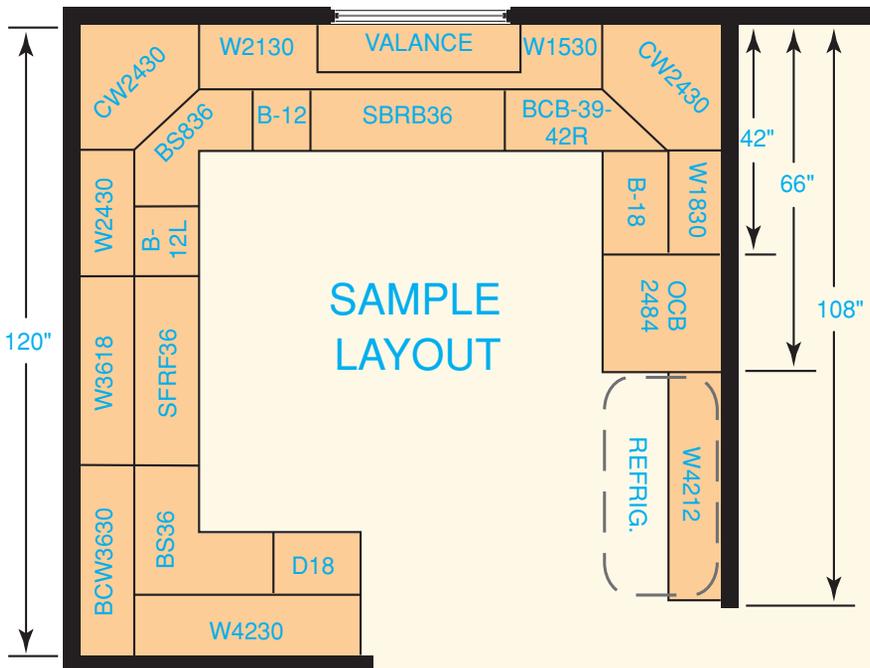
Cabinet Floor Plan Identity and Location The cabinets for this kitchen layout are identified by the manufacturer's stock numbers.
